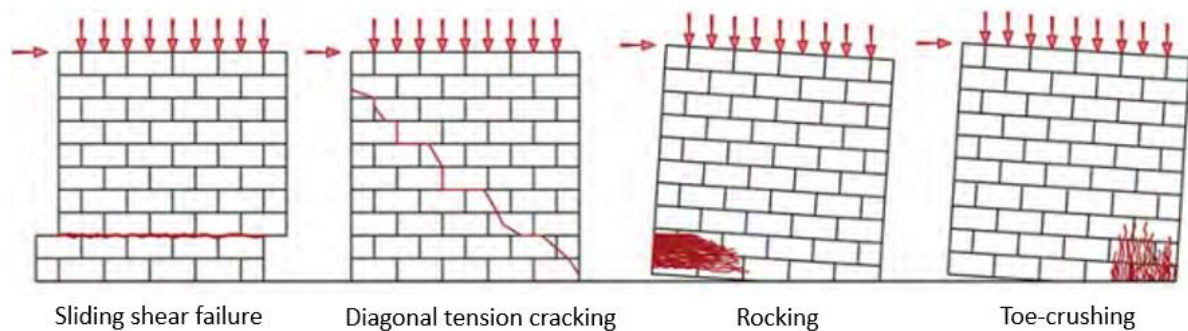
Typical in-plane failure modes of masonry walls (Oyguc & Oyguc, 2017)
